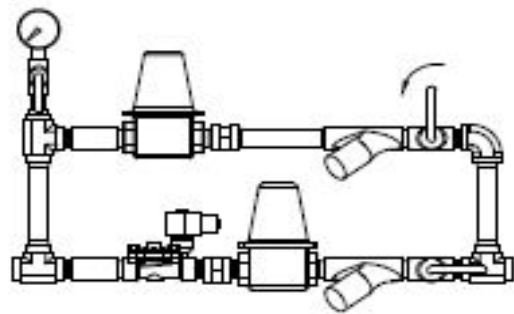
Fire Pump Drive Engine Bypass Valve
